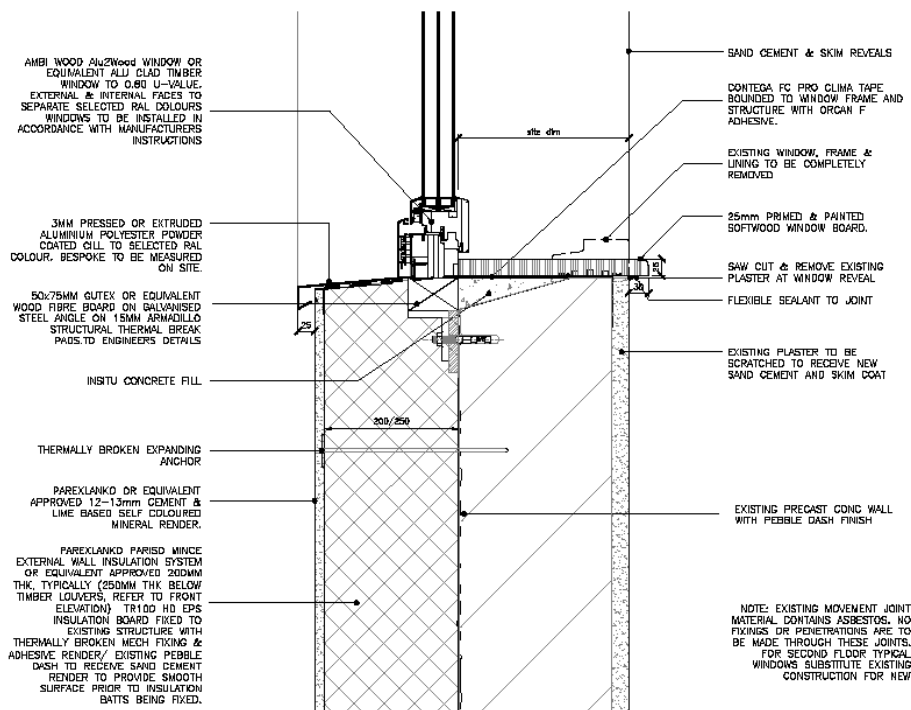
Window cill detail on the existing building (not to scale) [DLR Co. Co., 2014]
